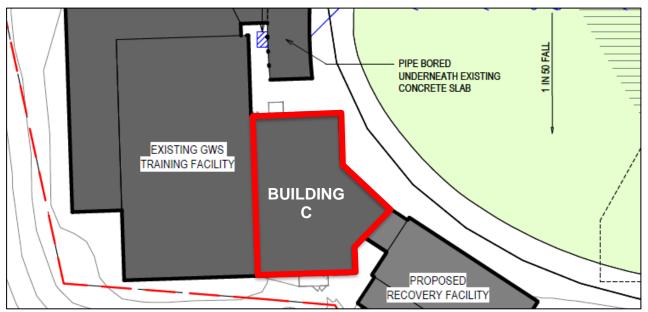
Extract from Site Plan illustrating Building C in red (*Source: Proposed Site Plan, prepared by Populous, 15 December 2023*)
